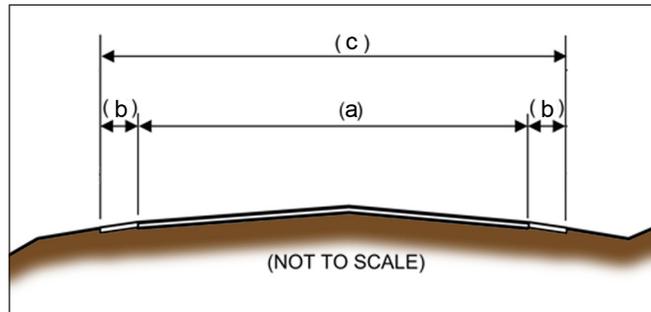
Cross-Section Profile -- Residential Collector with Reinforced Shoulder
